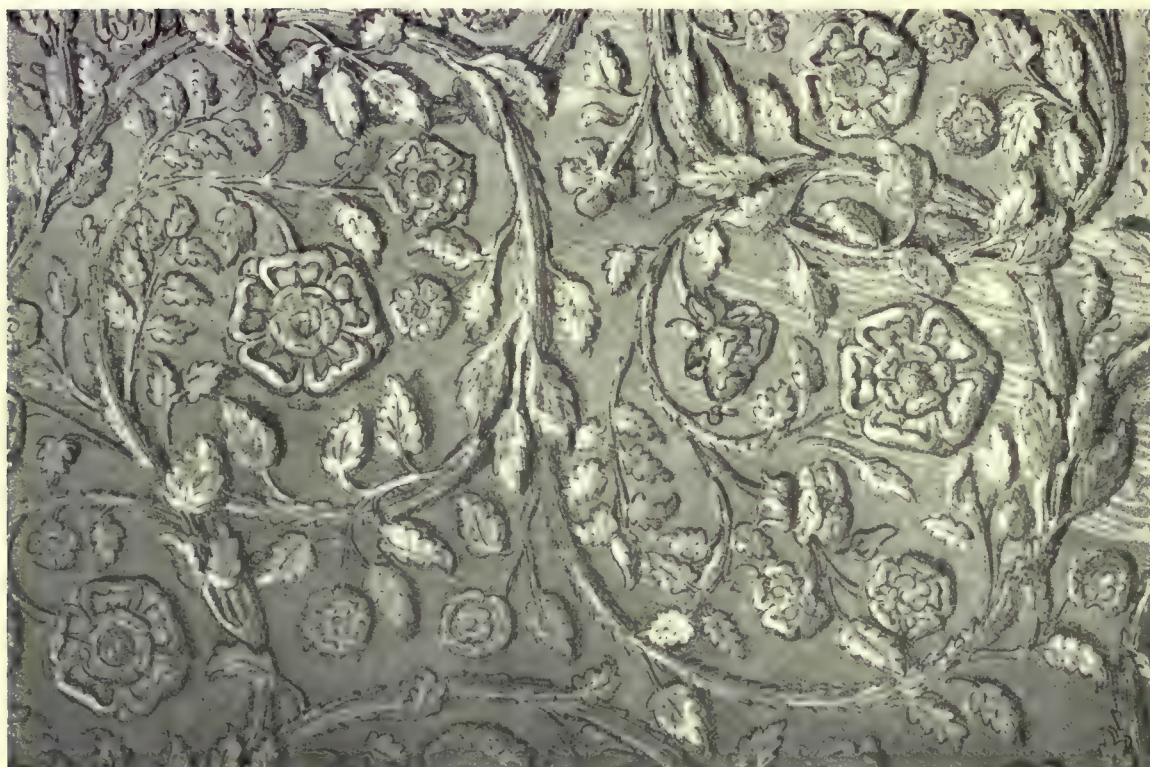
Sketch Detail of Modelling on Vaulted Ceiling,
